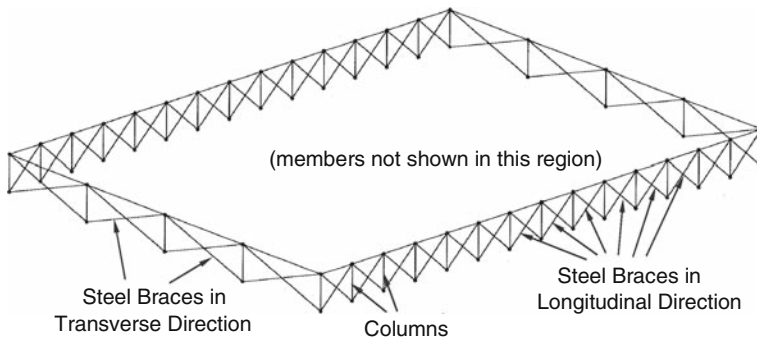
Layout of vertical braces around perimeter of prototype building
